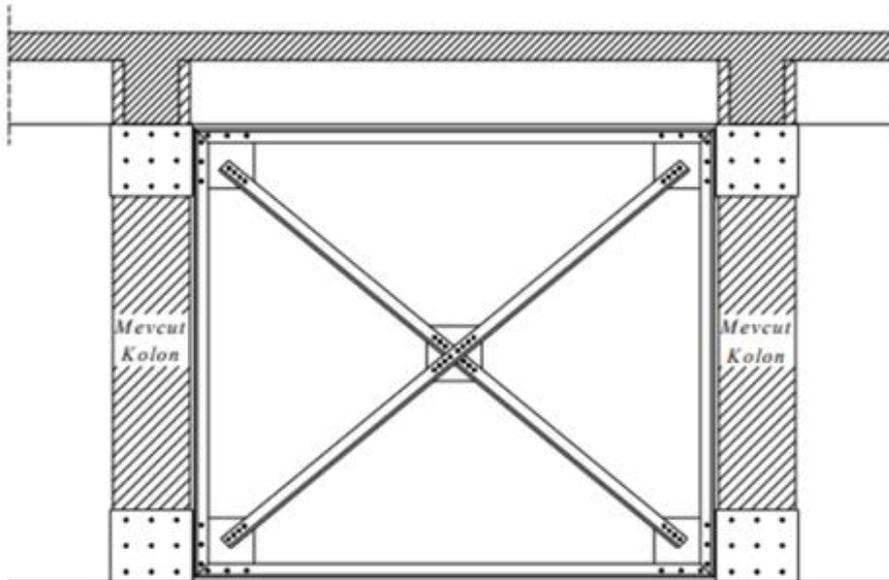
Reinforcement of frame with steel diagonal members (Karaca, 2022)
